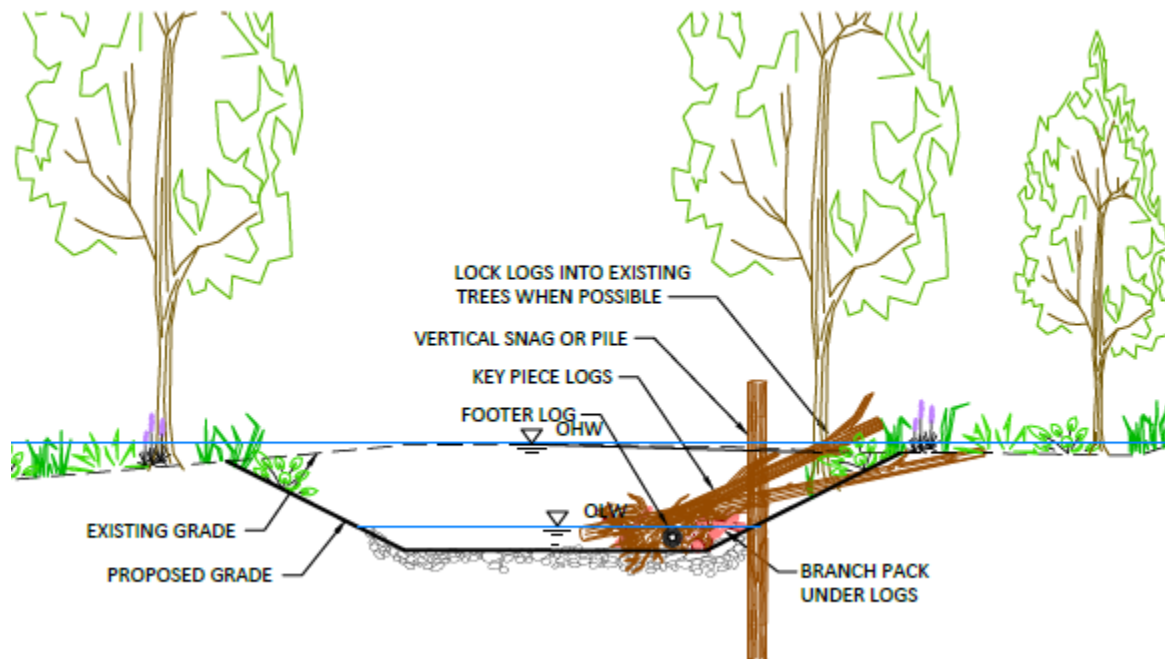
Typical section view showing margin LWD installed along the banks – relevant to Component 1 & 5.
